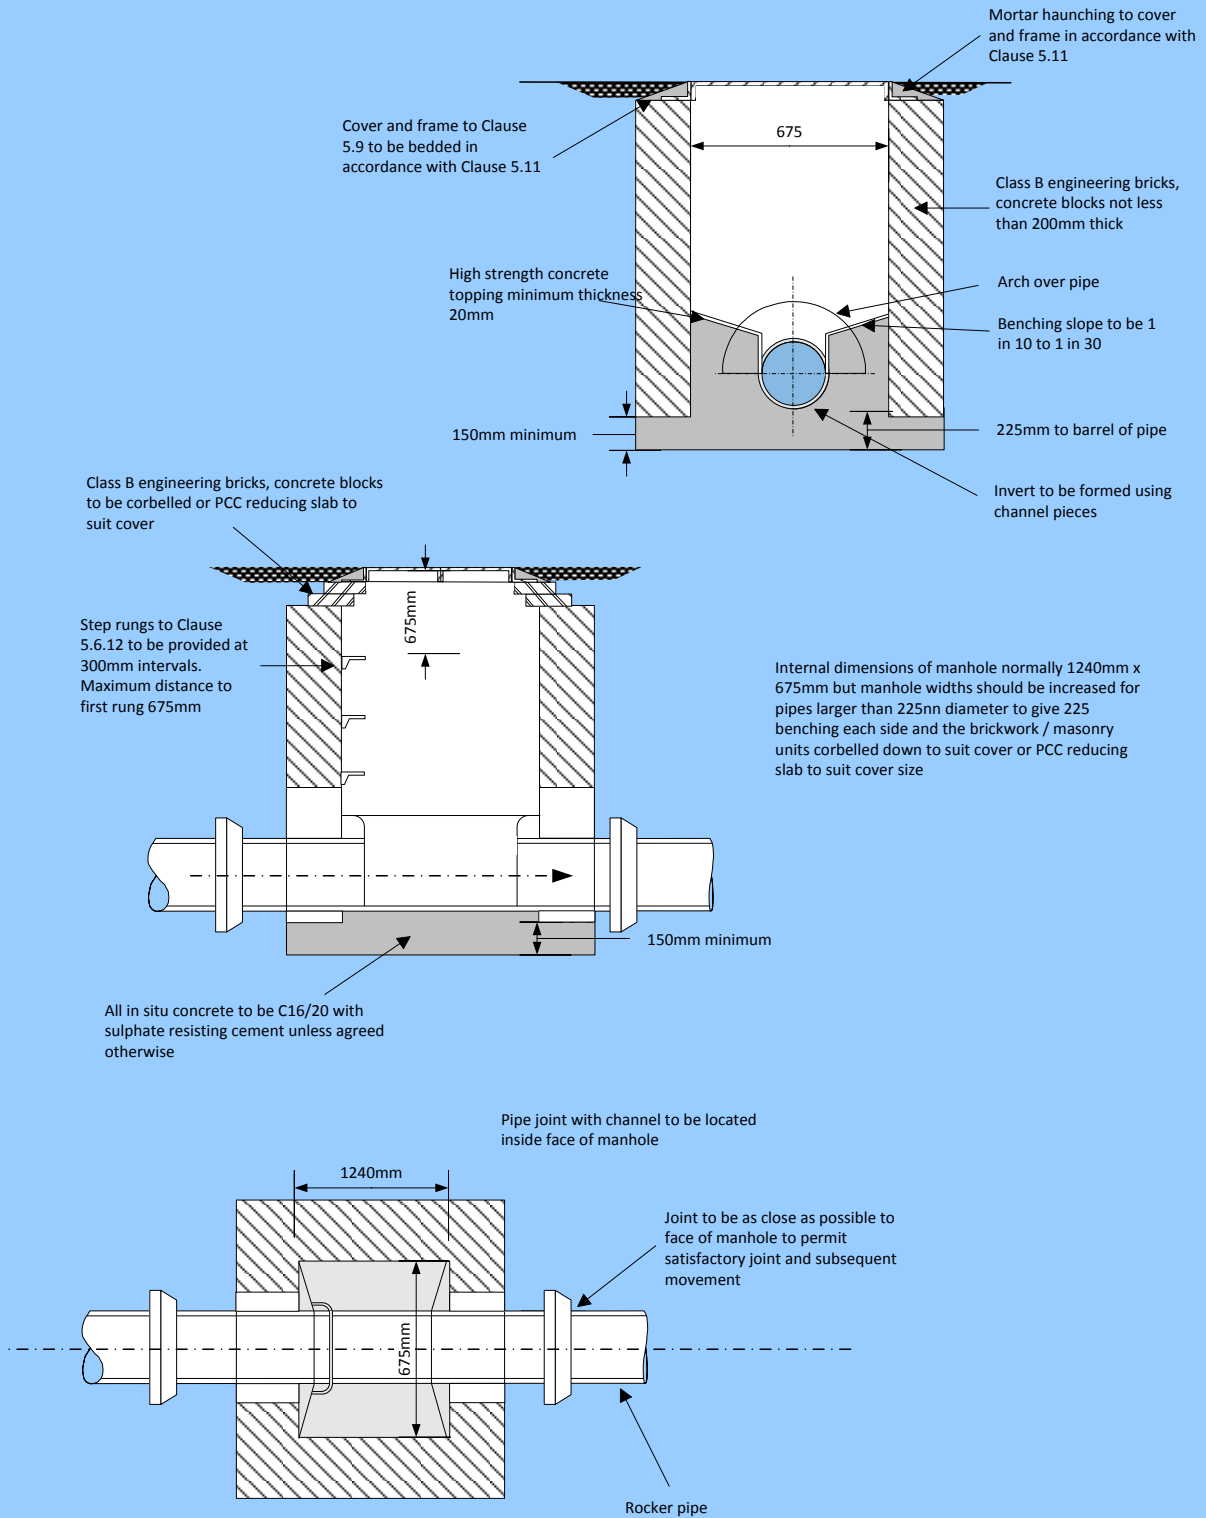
/4 - TYPICAL MANHOLE DETAIL - TYPE D
